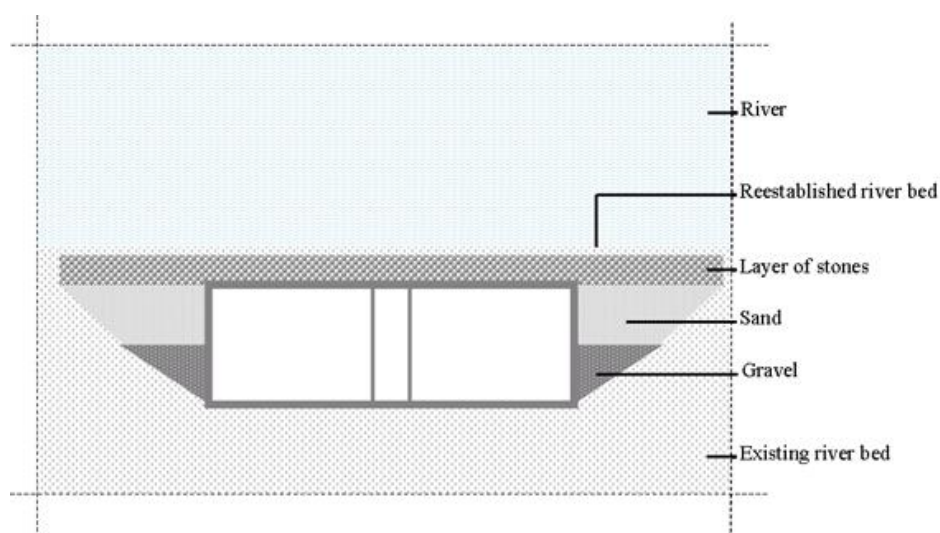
Schematized cross section of an immersed tunnel or cut and cover tunnel
